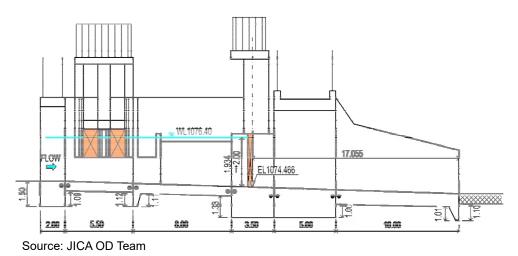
Assumed Structural Section on Headworks
